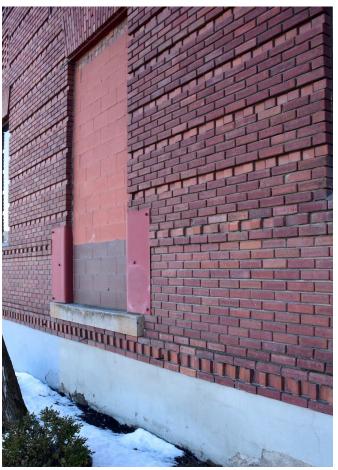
Detail of brickwork on the east elevation along Lincoln St.
